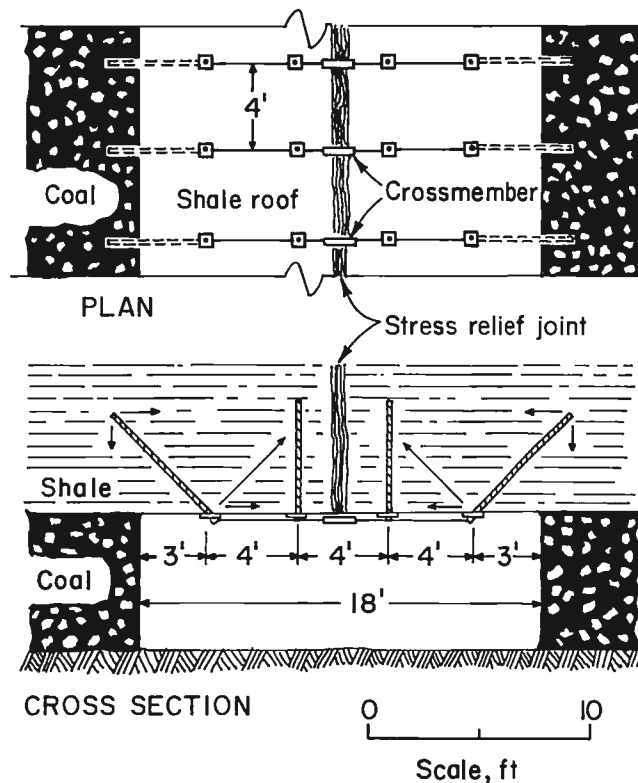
Typical roof truss installation to support stress-relief joint at midspan, with arrows indicating resultant forces.
